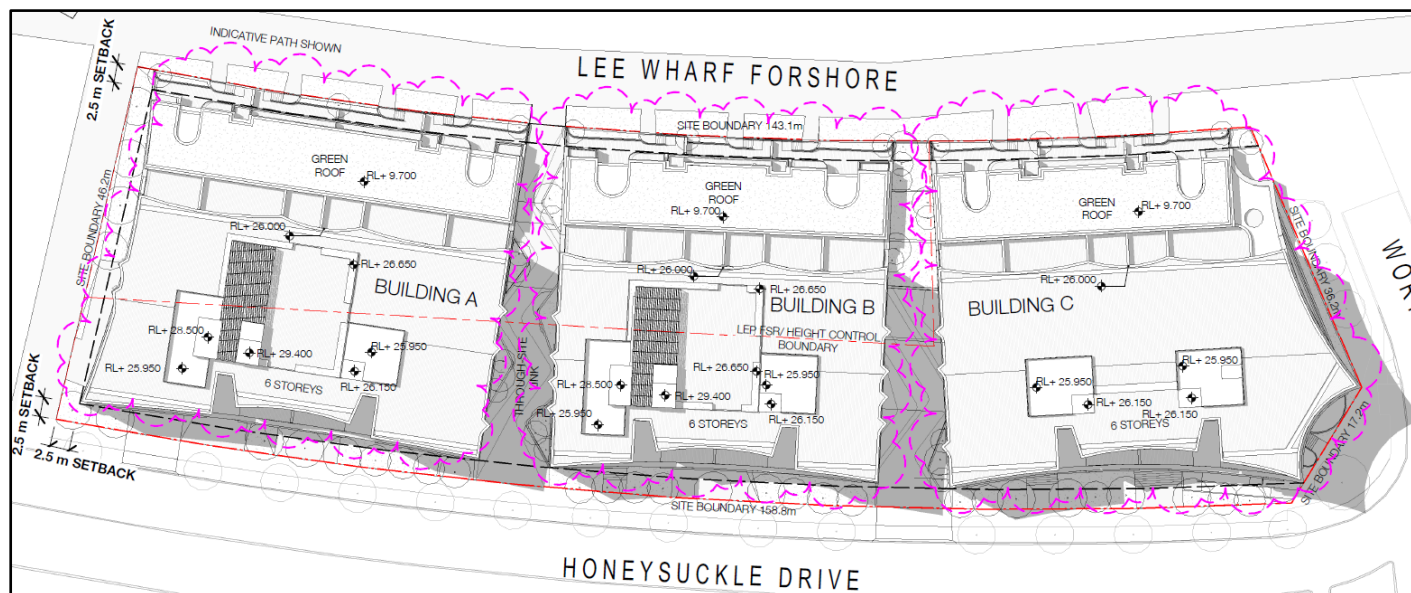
| Proposed Site Plan (Source: DA-0103 Rev 17 dated 15.05.19)
